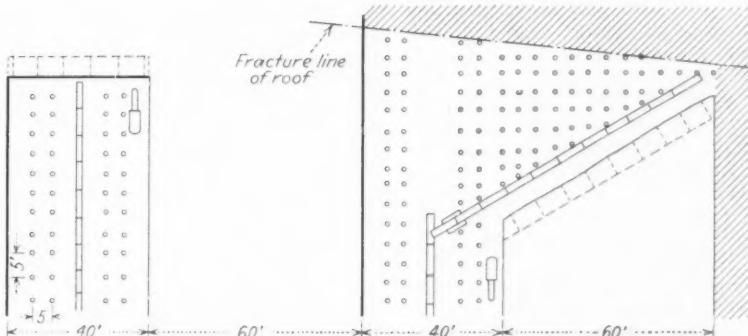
Timbering, drilling and conveyor plans in rooms and pillars
